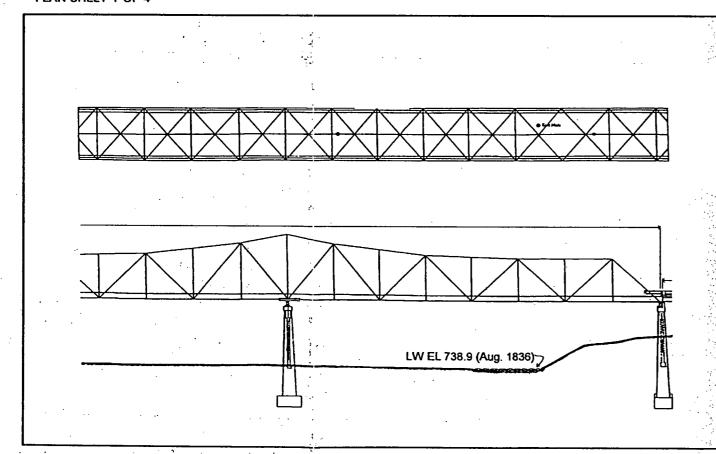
Elevation of the Brazos River bridge as shown in the 1939 plans.
